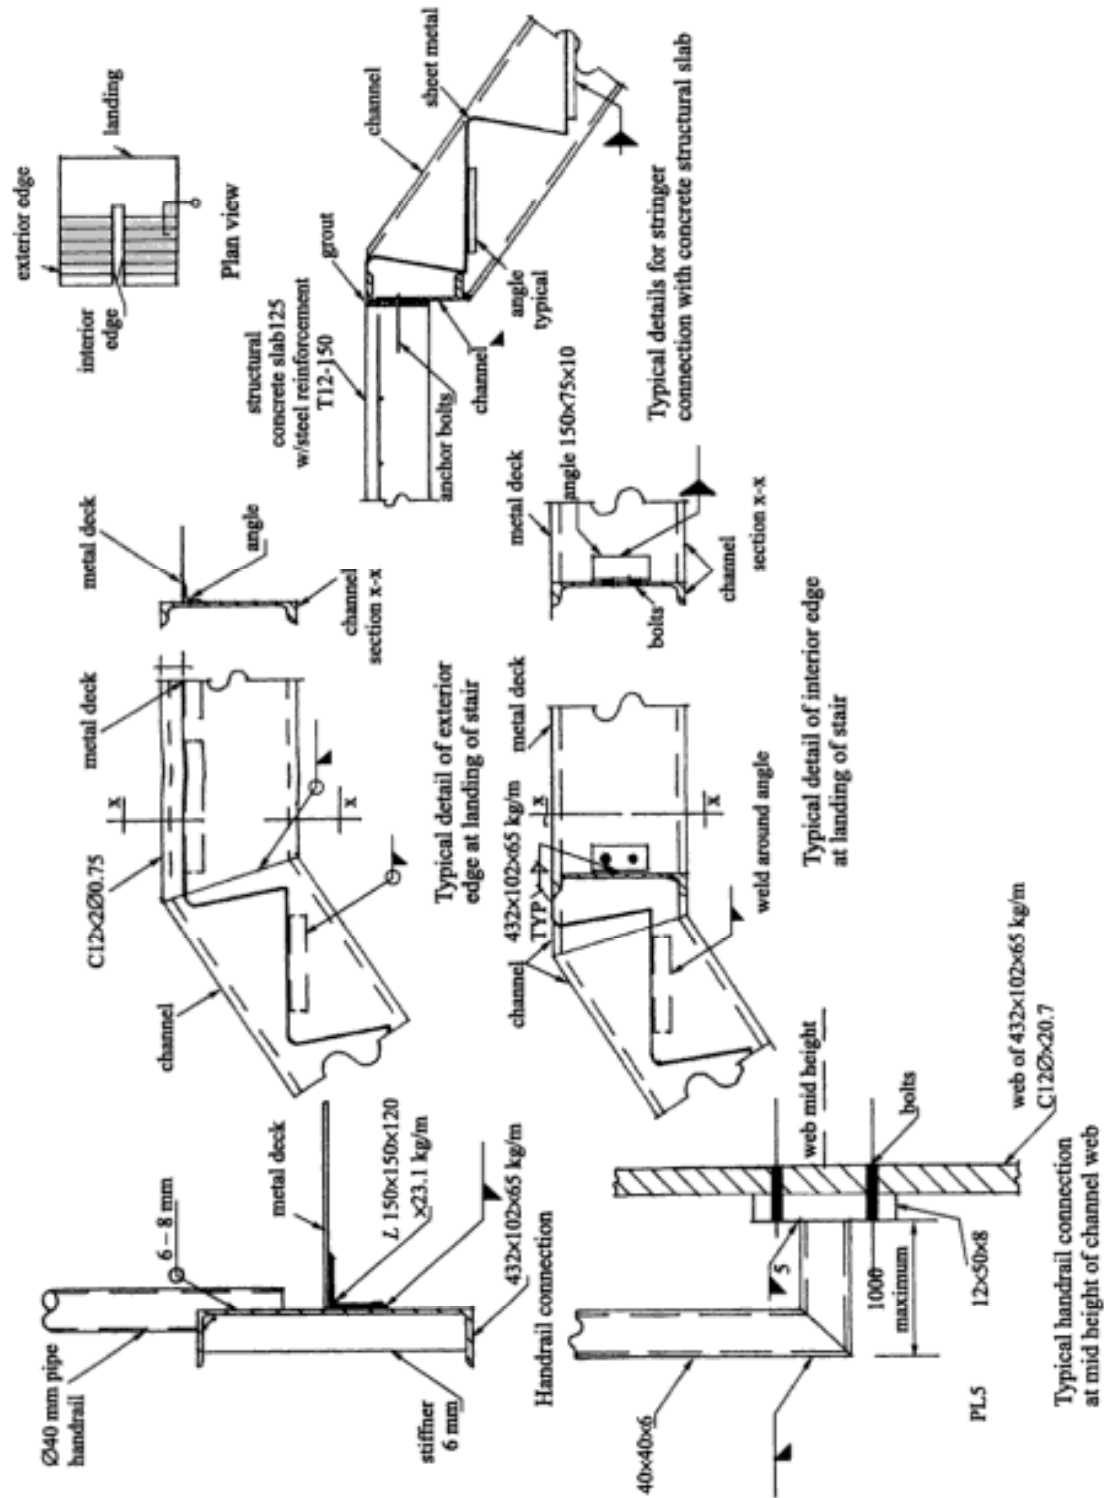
Connection details for steel stringers to concrete landings and handrails for steel staircases.
